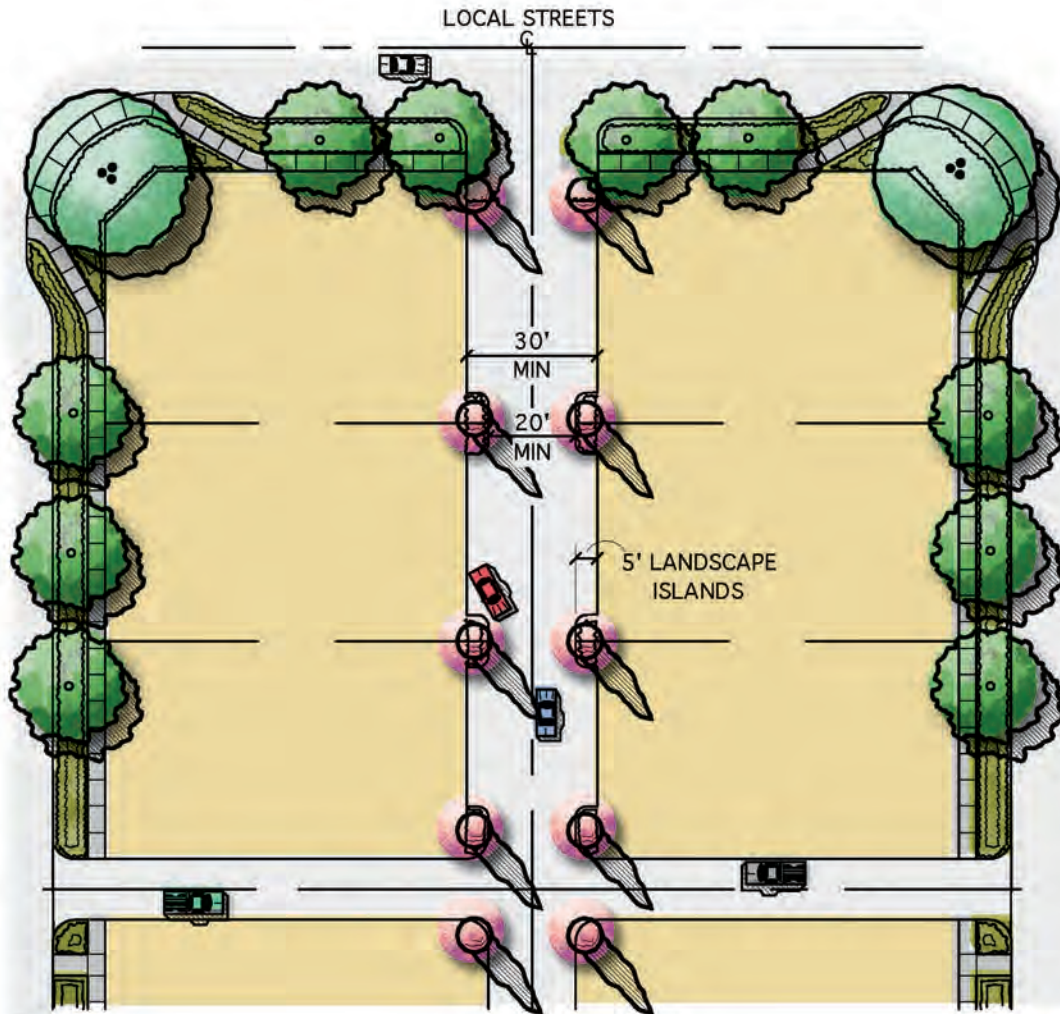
A—LOCAL AND CUL-DE-SAC STREET
